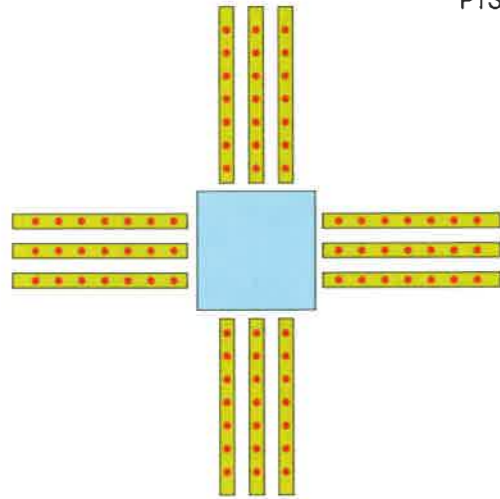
C-1 General Arrangement of Shear Stud Reinforcement
